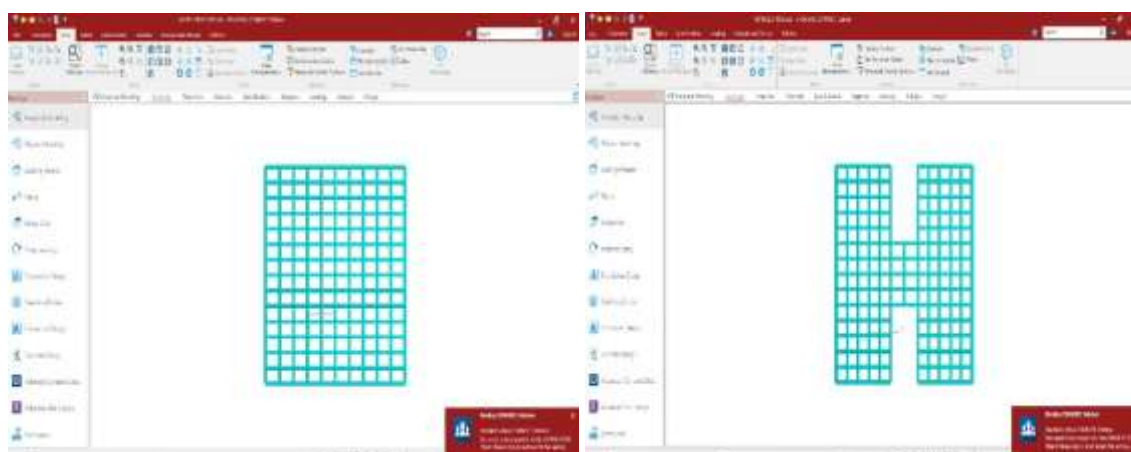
Floor plan of the Rigid Tube Structure and bundle tube structures
